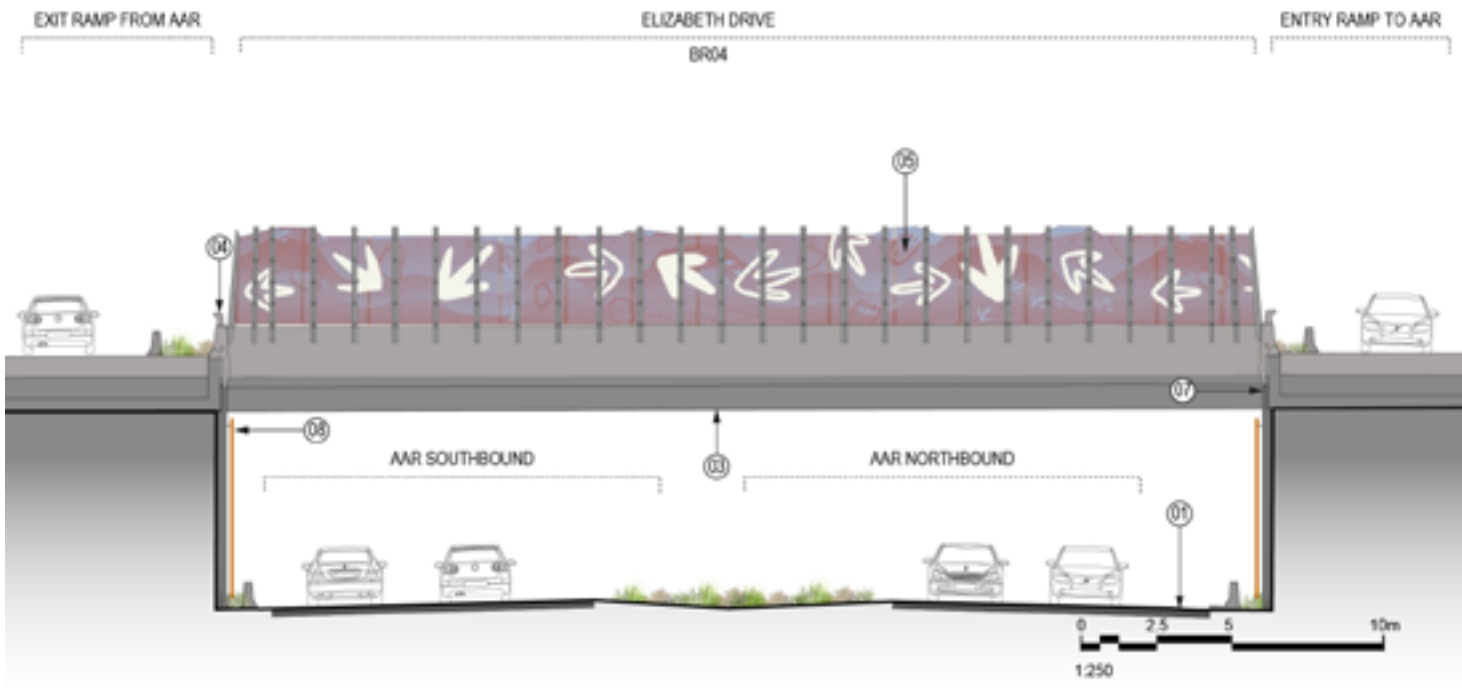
Section - BR04 - Bridge over Airport Access Road on Elizabeth Drive
